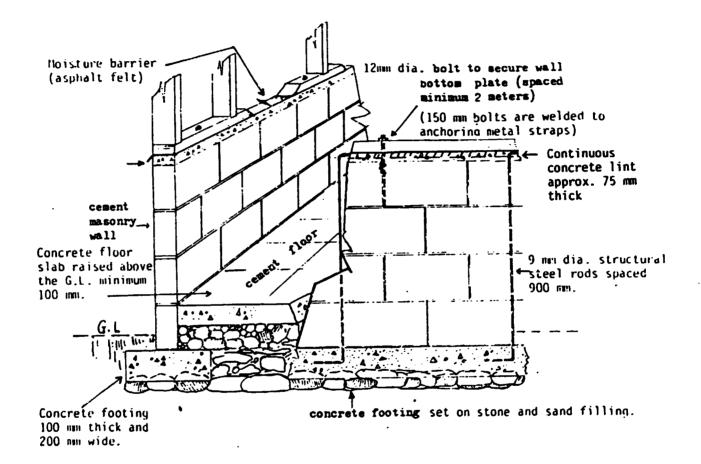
Footing and masonry posts arrangement with anchored post strap.
